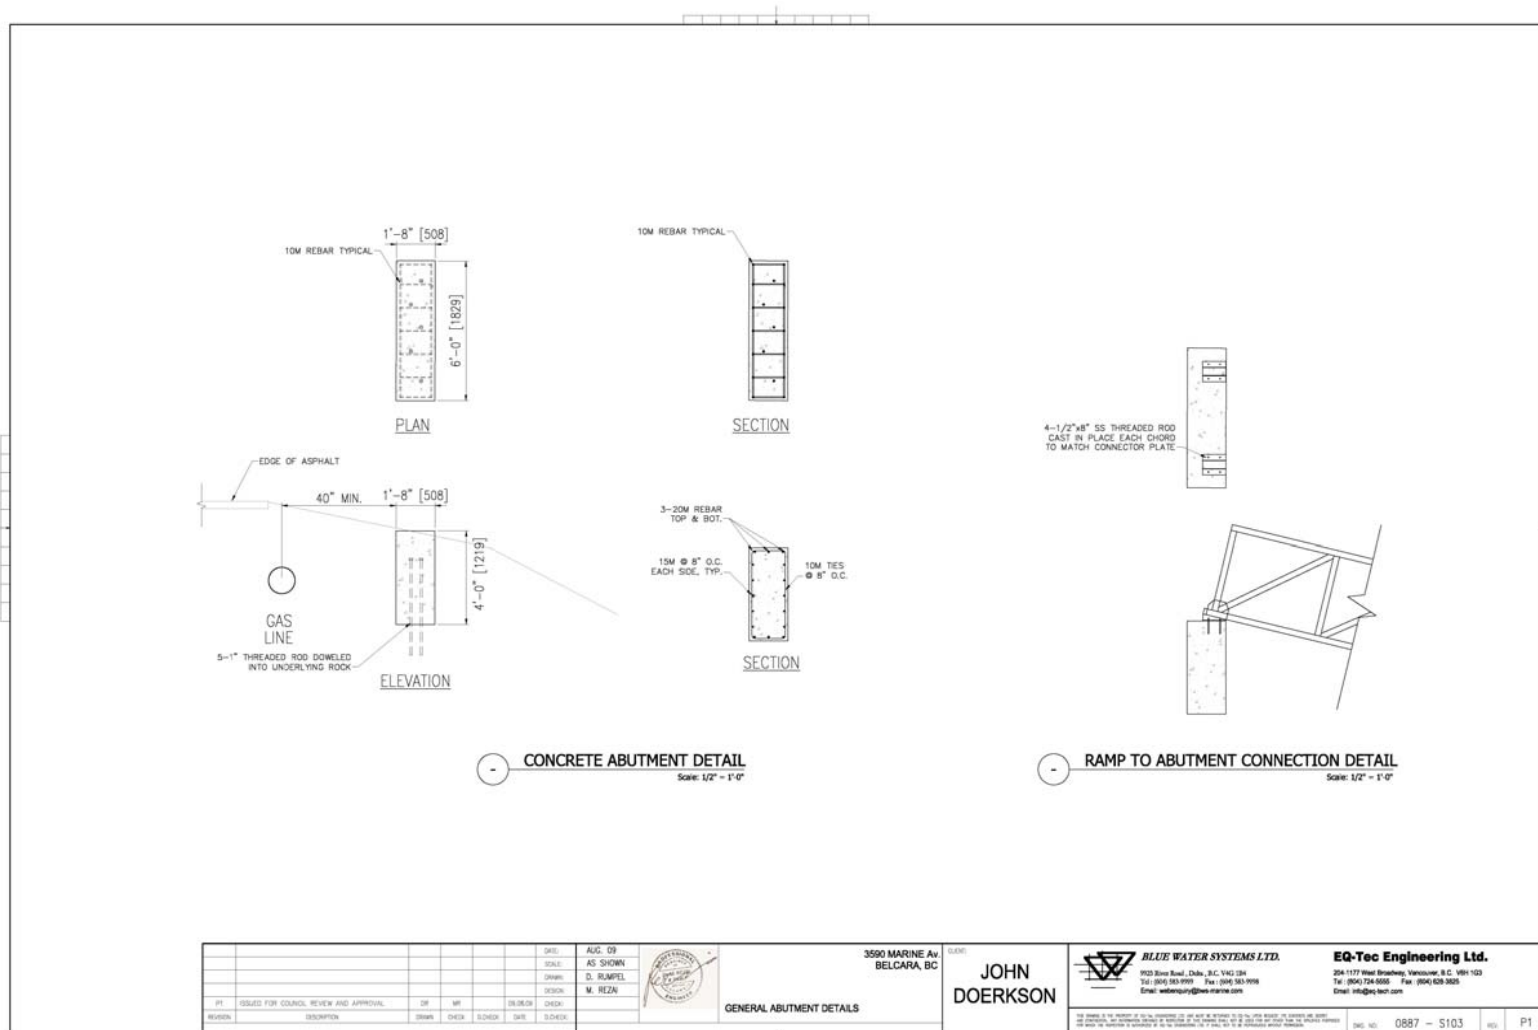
Typical landside abutment plans to be used for the proposed dock at 3707 Dollarton Highway, North Vancouver.
